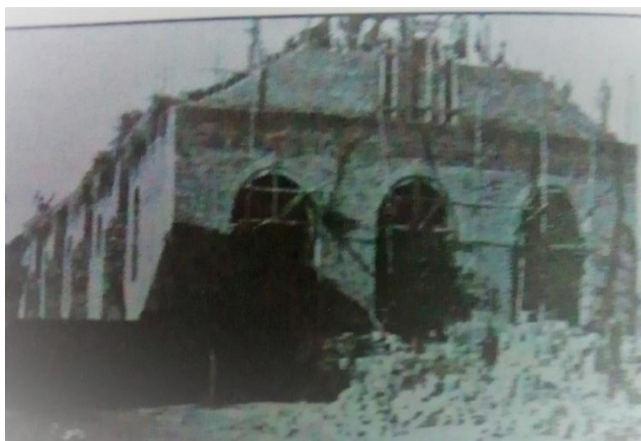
Masonry Work Building of the First Church of Kashozi Mission 1903
